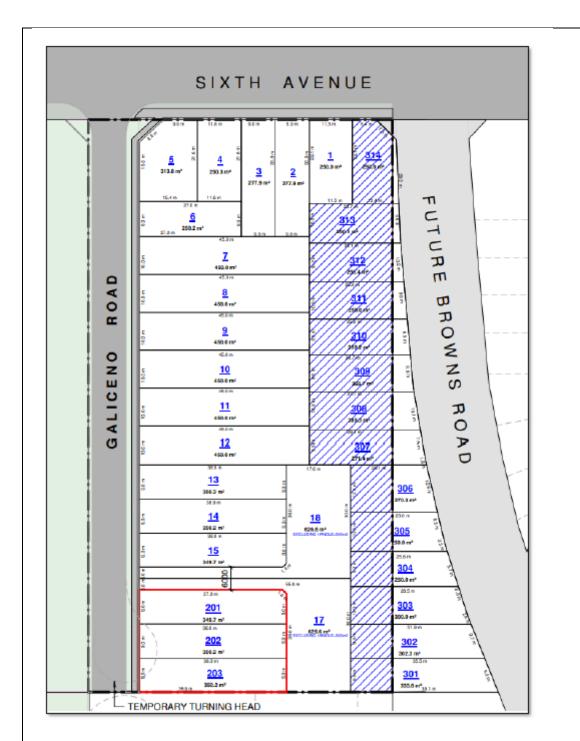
A concept subdivision plan showing the future potential development provided by the applicant that aligns with ILP that can occur when developed with the adjoining neighbour.
